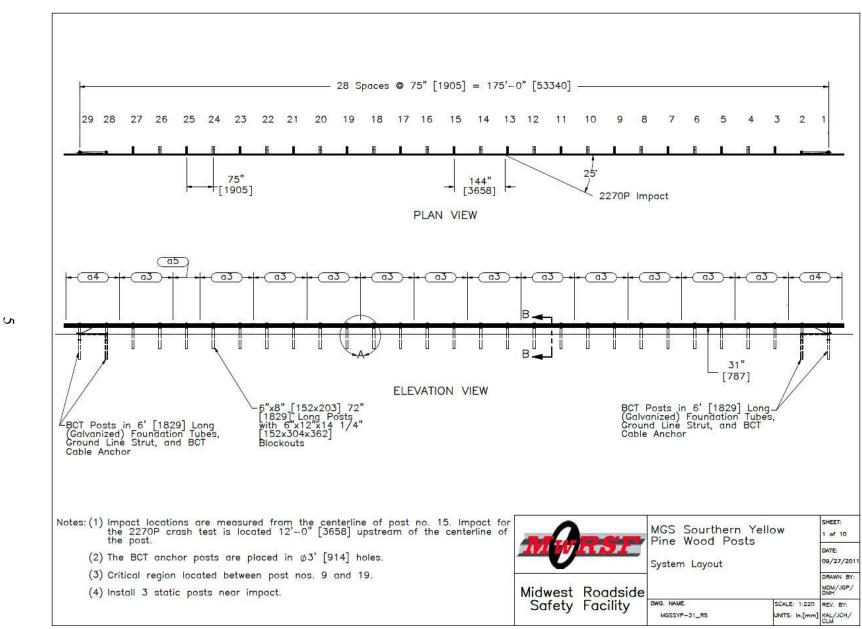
Test Installation Layout, Test No. MGSSYP-1
